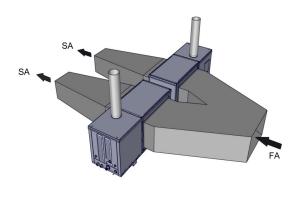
TYPICAL PARALLEL FURNACE INSTALLATION
